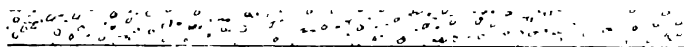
Waviness of Sheet Asphalt on Concrete Foundation.
